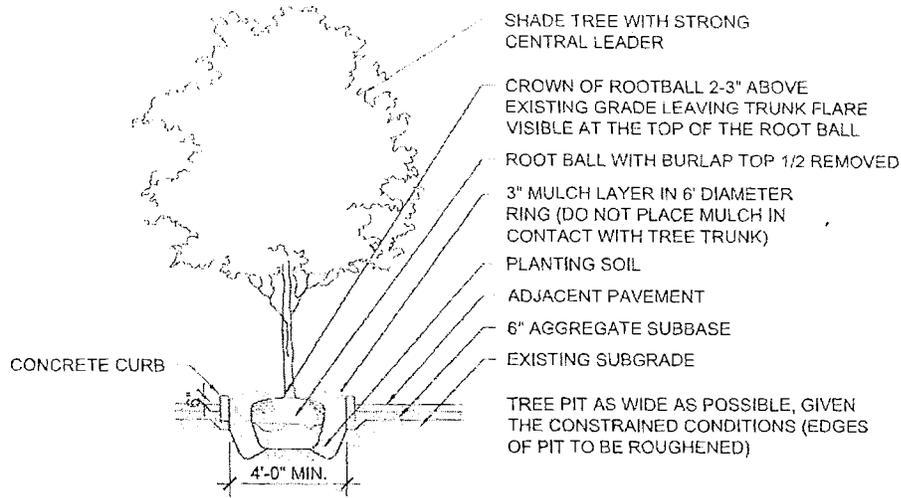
A: SITE AND LANDSCAPE PLAN
